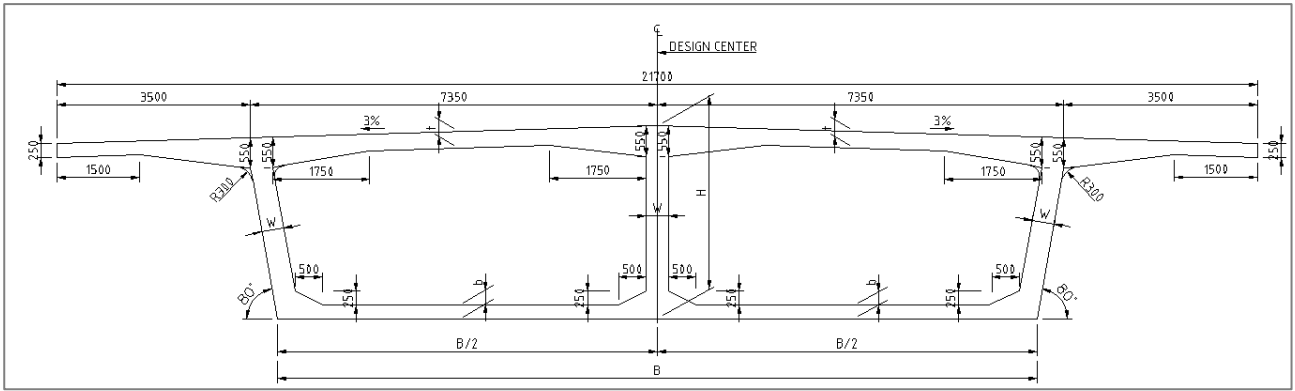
Cross Section of Balanced Cantilever Bridge section
